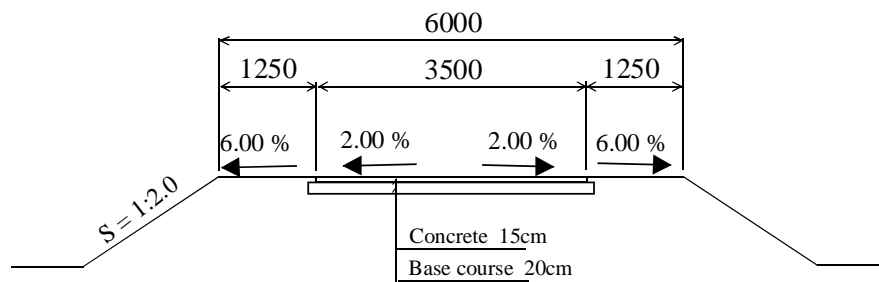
Concrete Pavement Structure (Inundated Section)
